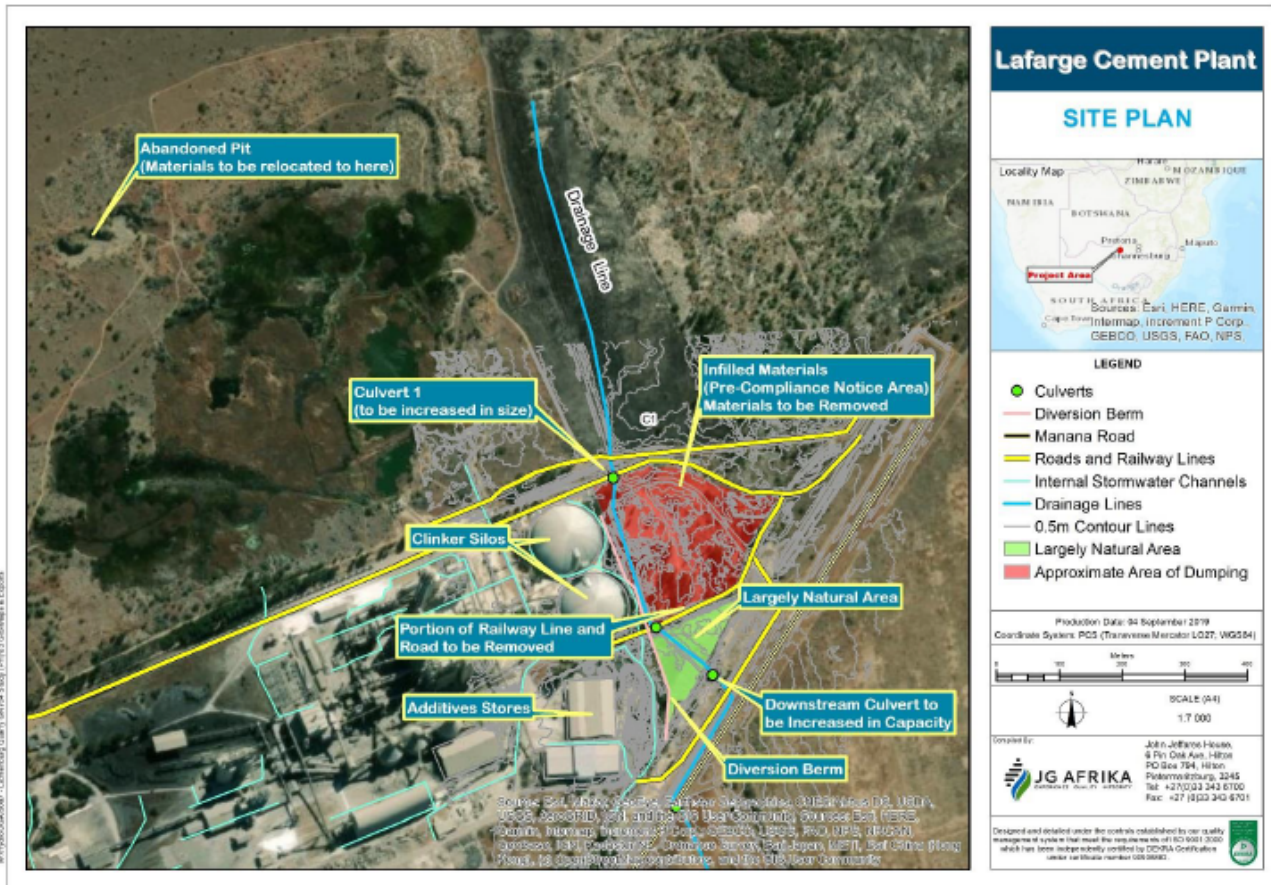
Lafarge Lichtenburg site plan for rehabilitation
